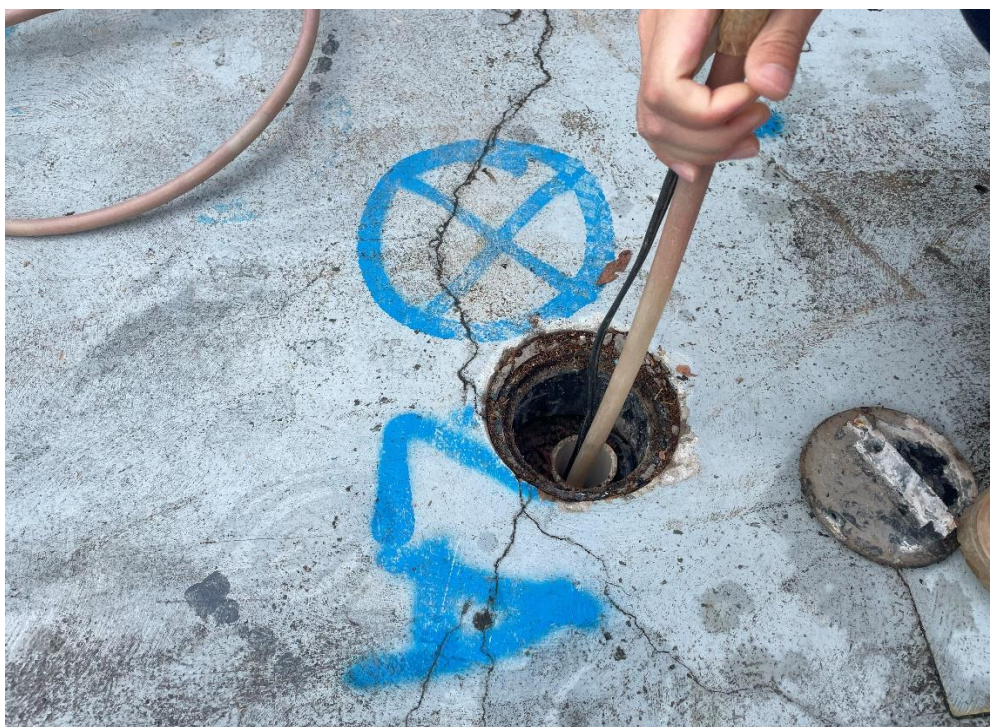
Performing slug test (rising head test) in BH02 - 22 April 2025
